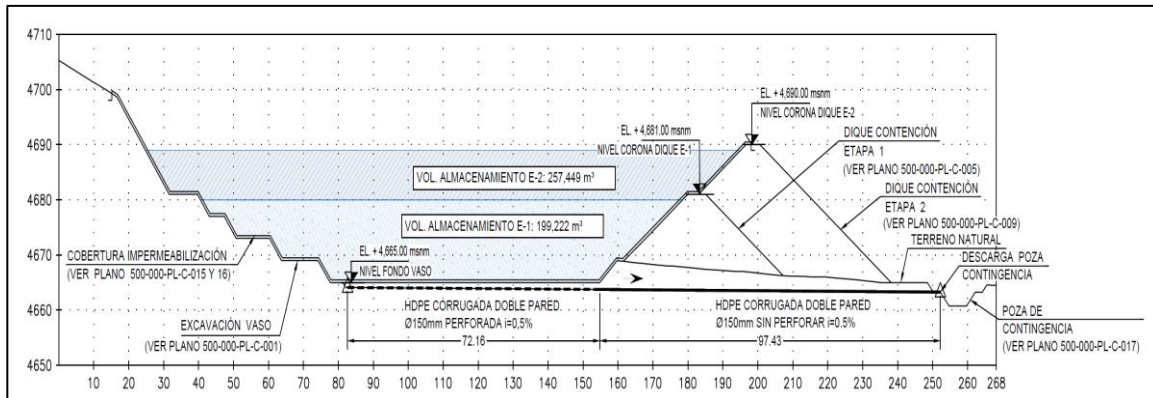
Representative Section – Bethania Tailings Facility (UCSC 2021)
